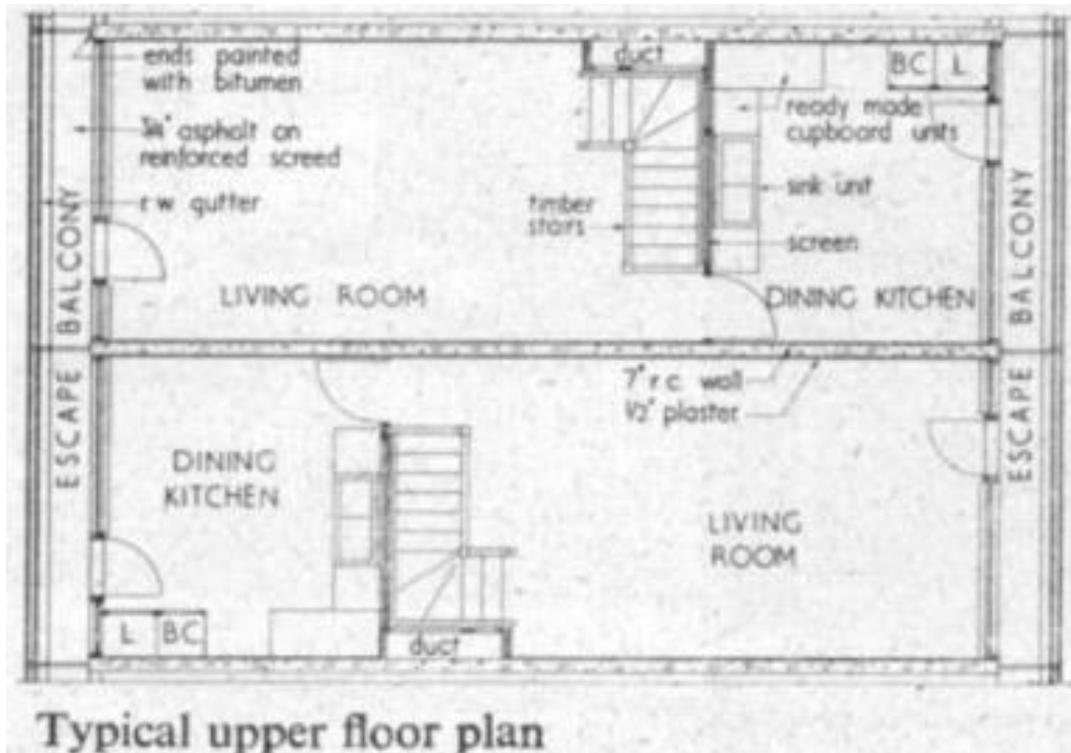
Architects Journal – Typical maisonette upper floor plan layout. Source: <https://www.architectsjournal.co.uk/news/sceaux-gardens-camberwell-the-original-1960-aj-building-study>
